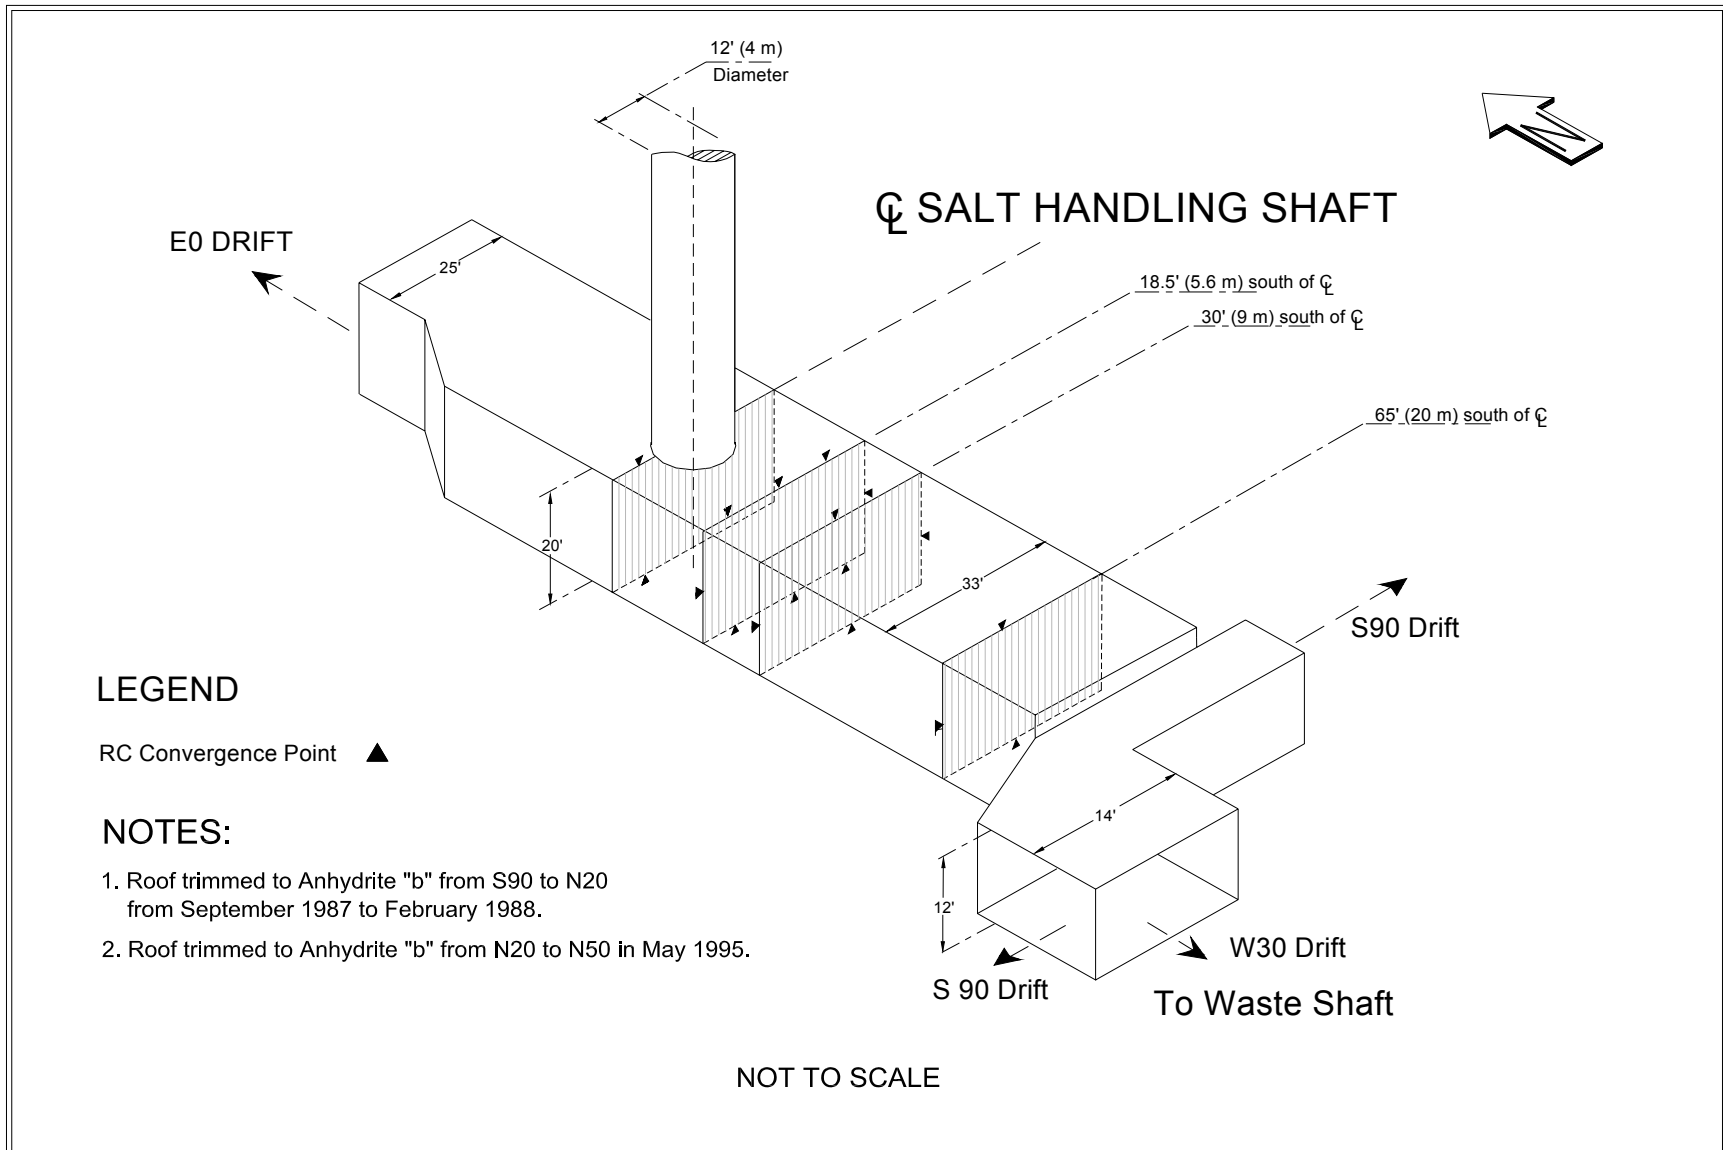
Salt Handling Shaft Station Instrumentation After Roof Beam Excavation
